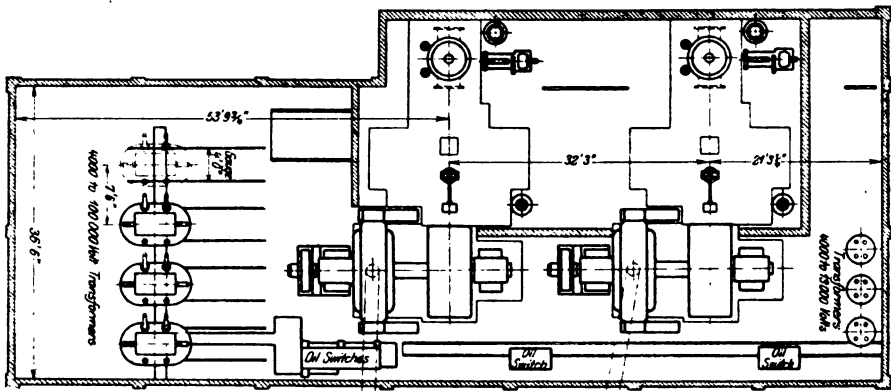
Arrangement of Apparatus. Boulder Power House.
